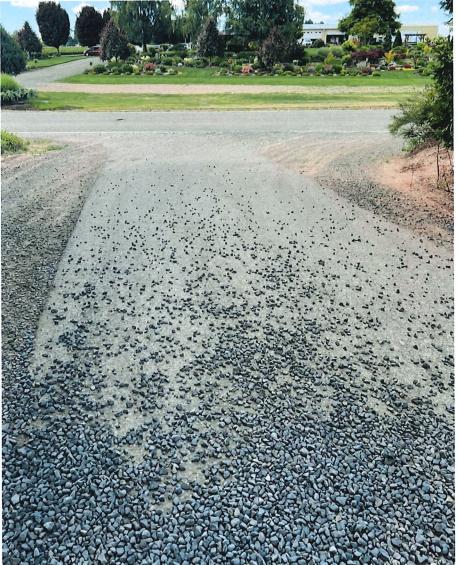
View of 57th Street NE facing south toward Brooklake Road. *Photo date: June 2025.
